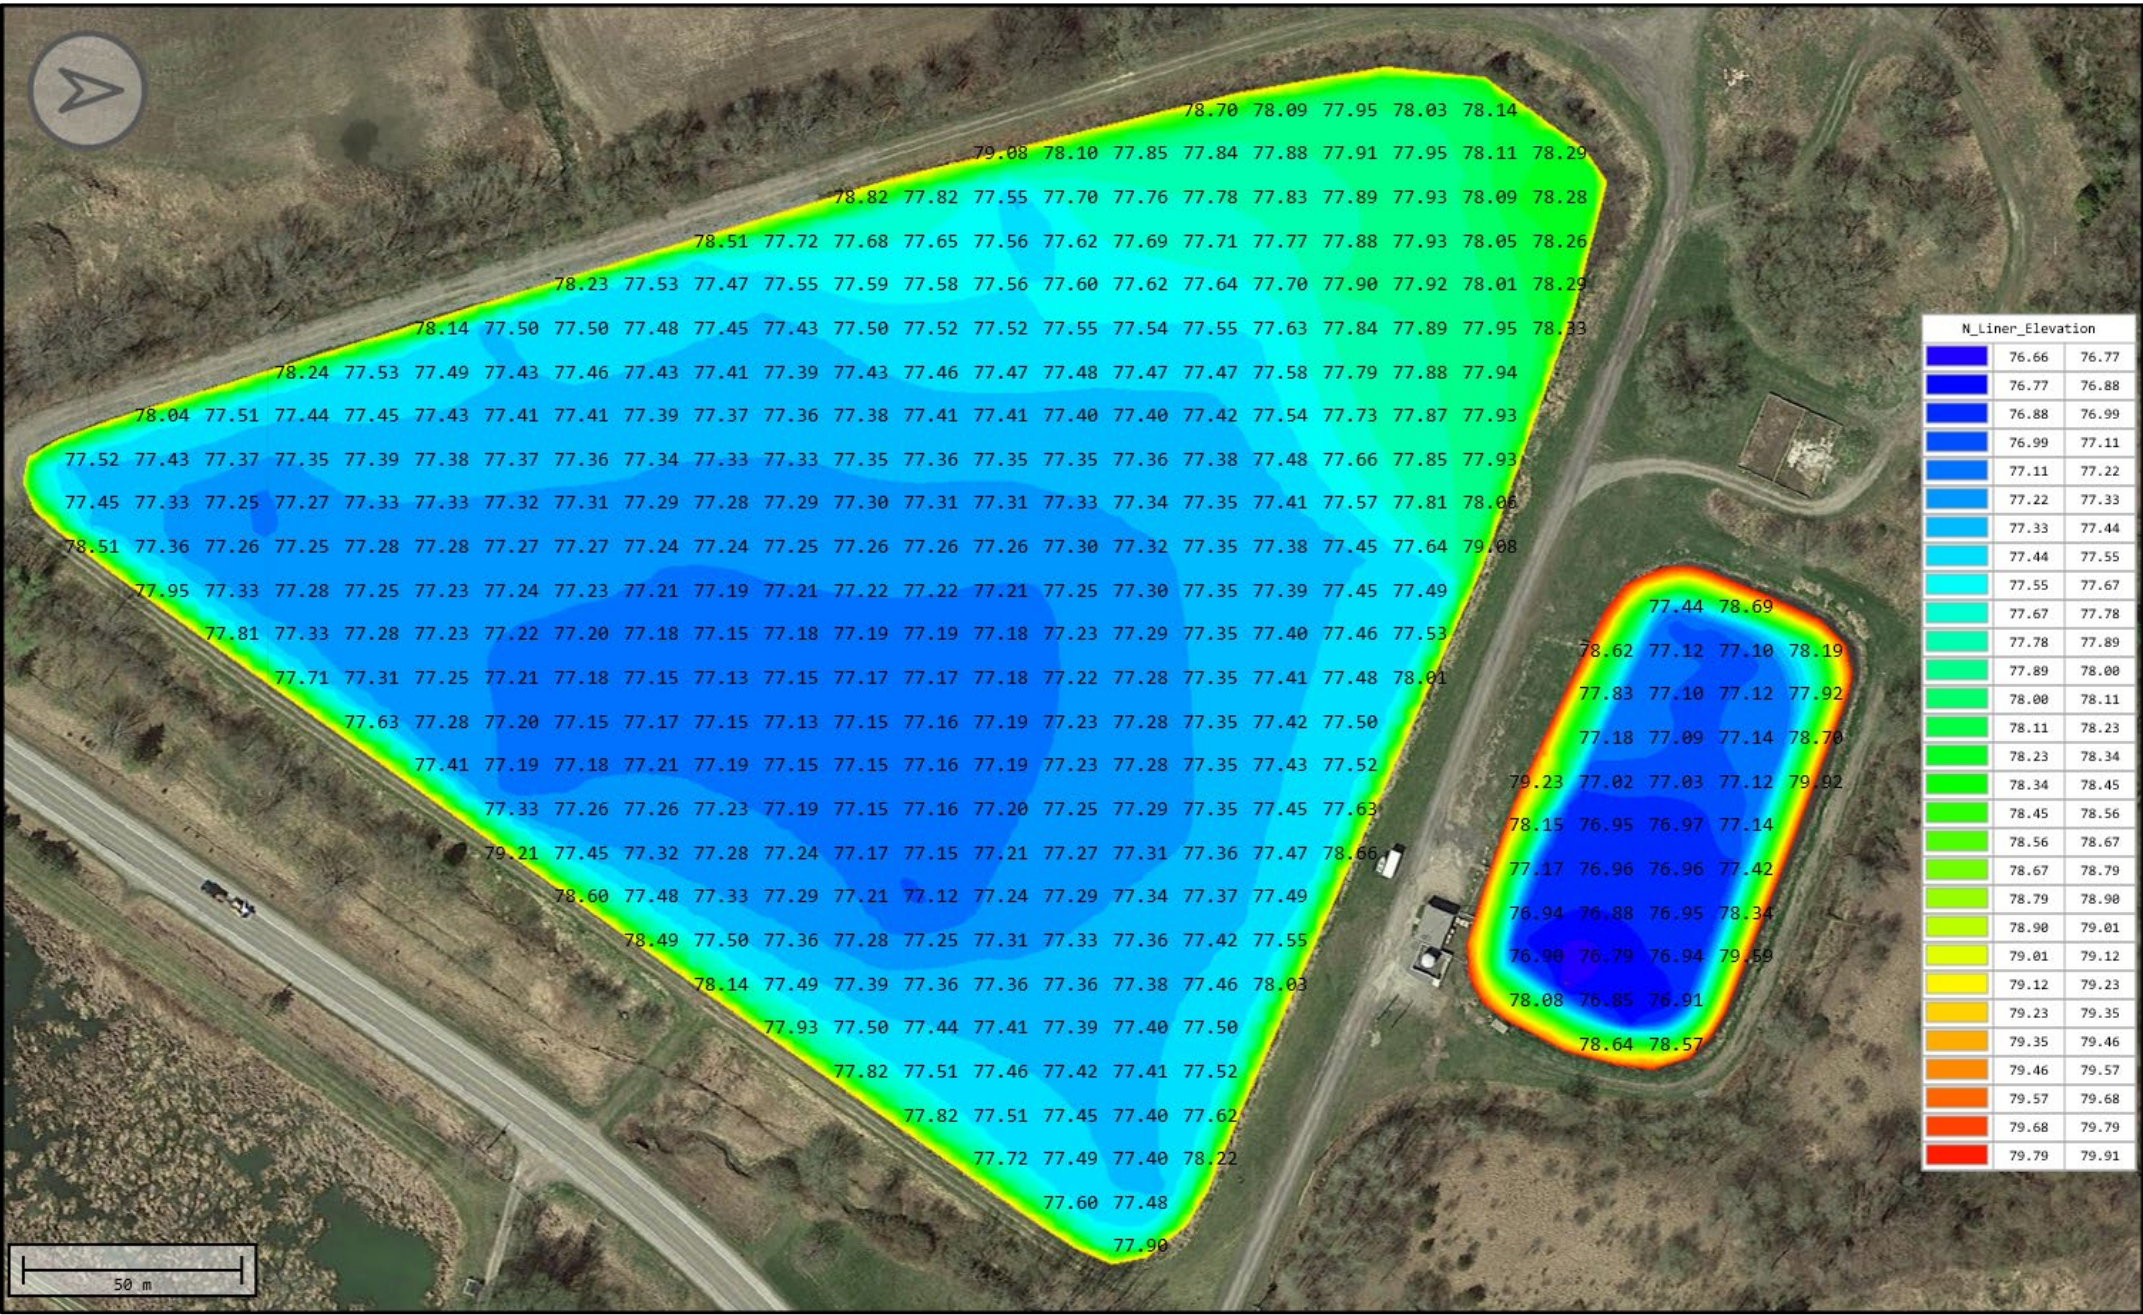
Stabilization & Aeration Lagoon liner elevations used for volume calculations (m)
